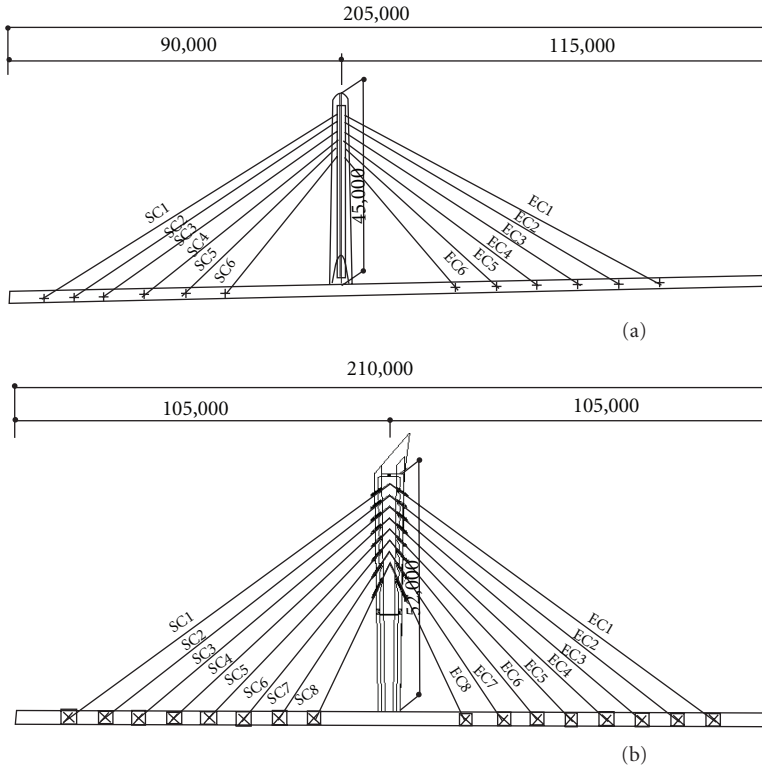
Dimensions and overviews of the bridges. (a) Yeongduk cable-stayed bridge. (b) Incheon new port cable-stayed bridge.
